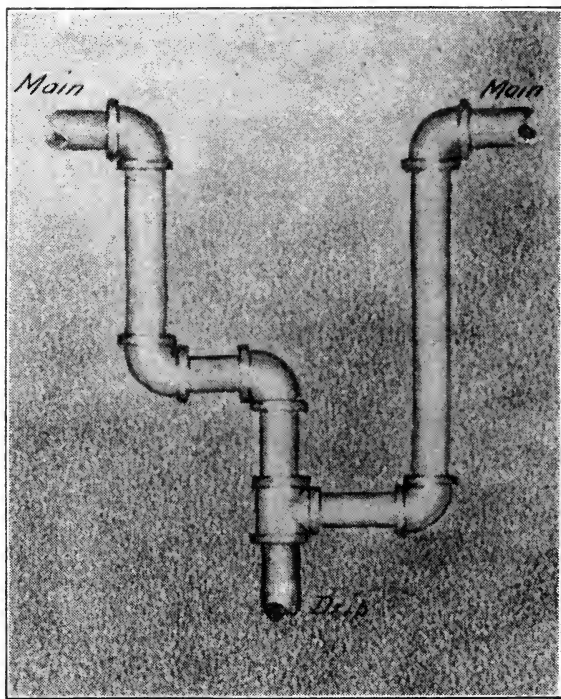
A Better Arrangement of Dripping Two Mains into One Drip Pipe.
